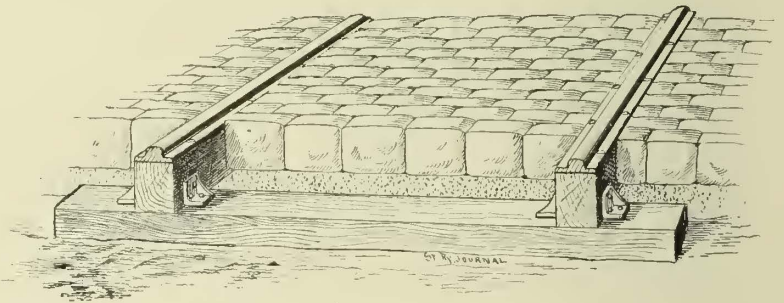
STRINGER CONSTRUCTION WITH CENTRE BEARING TRAM RAIL.
